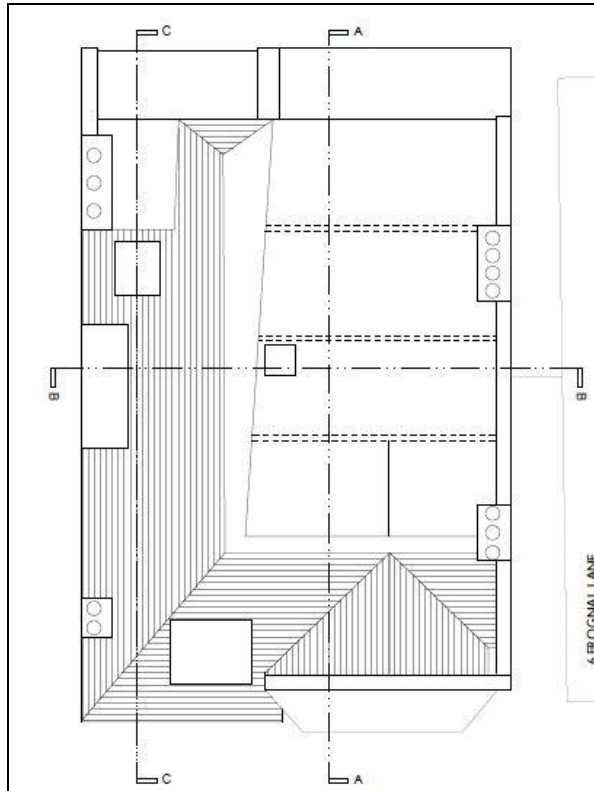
Extract from drawing 7395/ 110 Existing roof Plan
